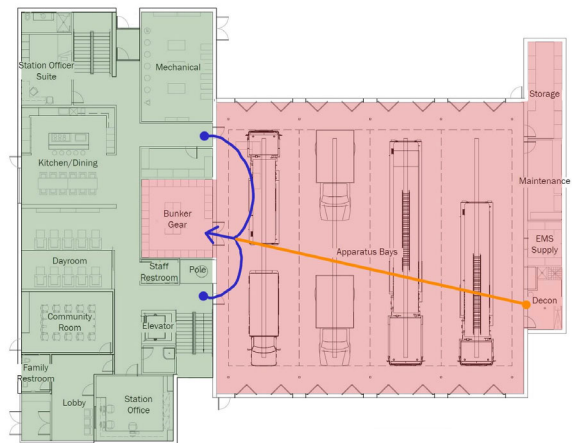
Diagram of Salt Lake City Fire Station 14 First Floor Plan <sup>51</sup>
